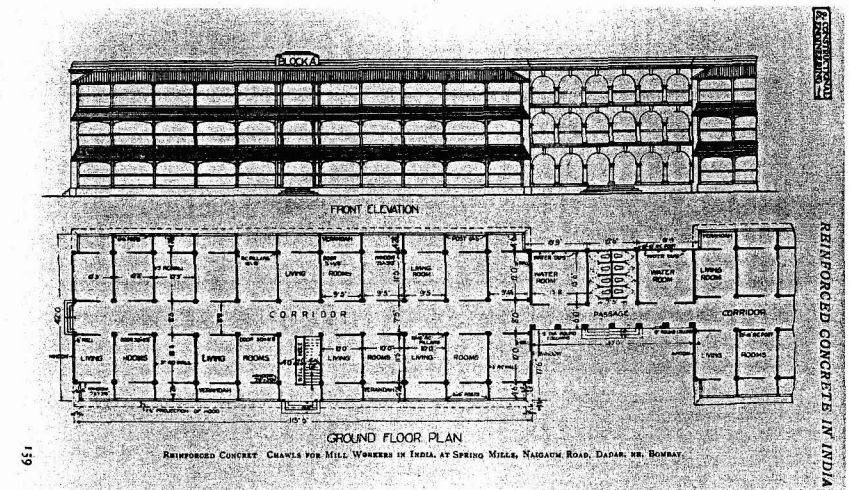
Spring Mill Chawls, elevation and plan (from *Concrete and Constructional Engineering*, March 1917).
